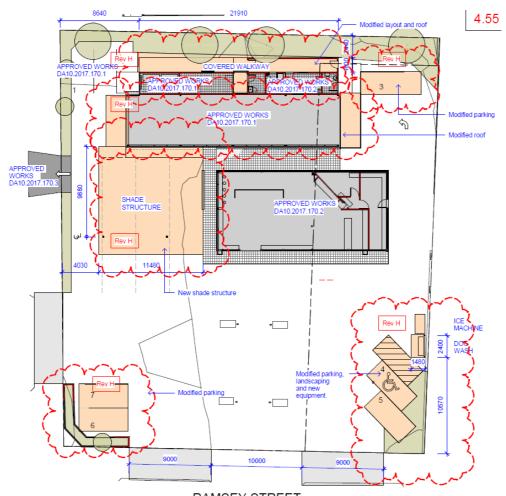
Proposed car parking plan indicating seven (7) car parking spaces.
